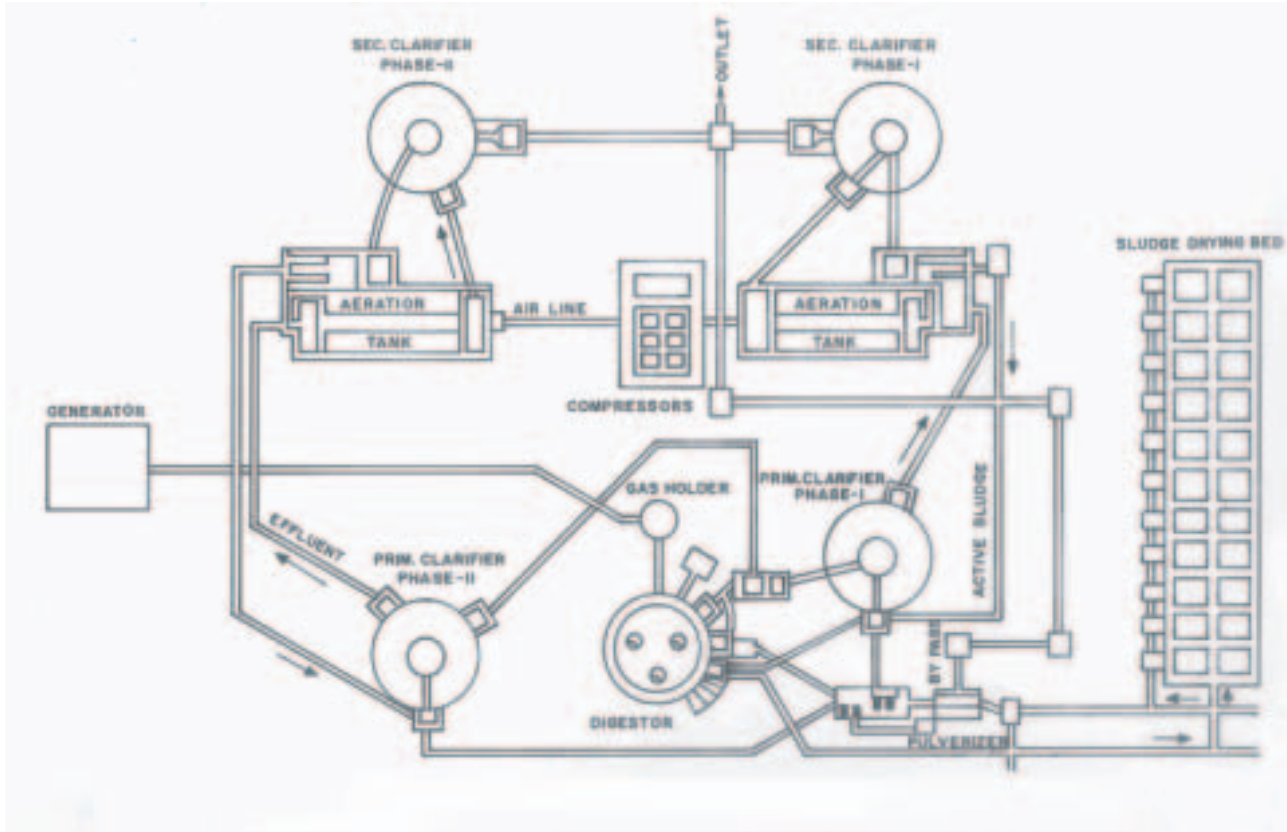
Layout of the wastewater treatment plant at Islamabad.
